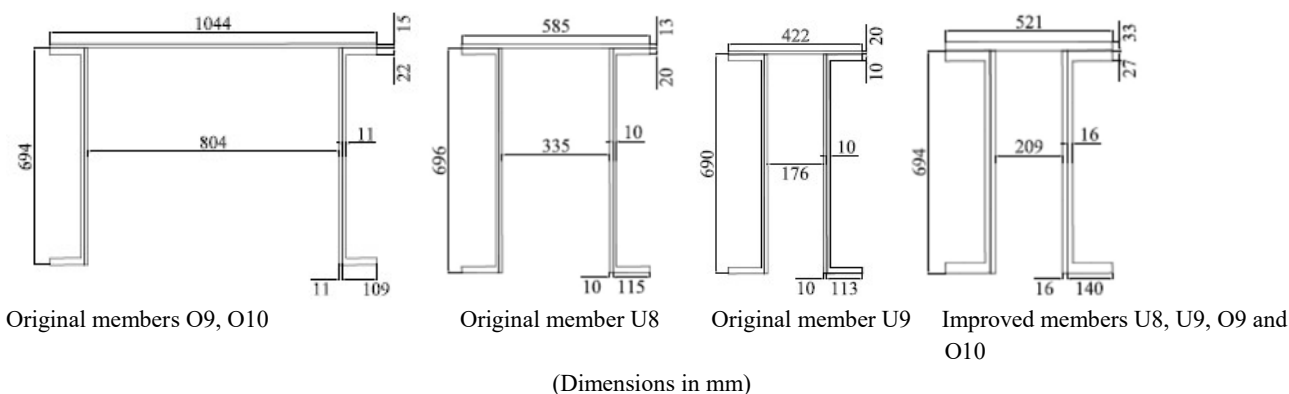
Estimated cross sections of original and improved members to resist dead load for damage structure (E1 damage)
